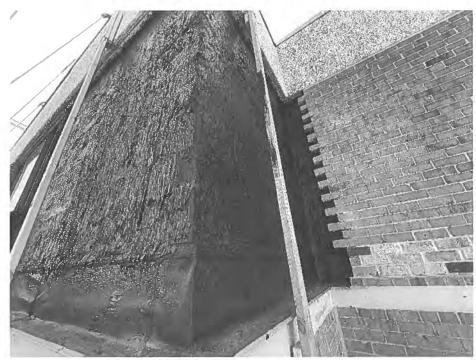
View of the Application of Waterproofing Membrane on the North and West Walls of the Unit 4-1302 Walk-In-Closet
